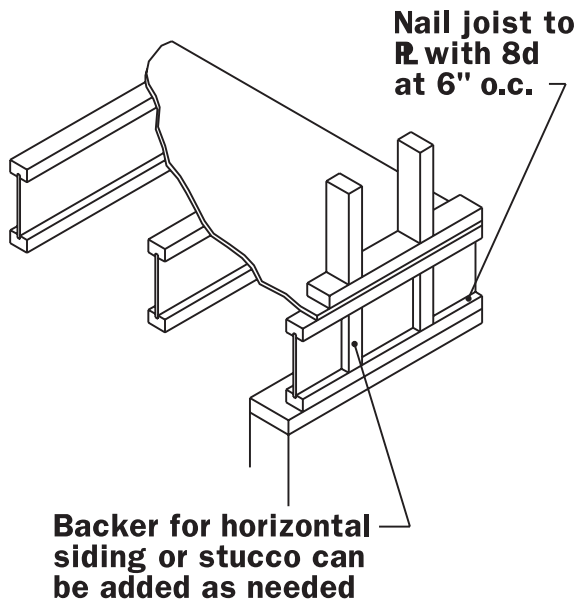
Column Load Transfer Through I-Joist Floor System to Foundation
